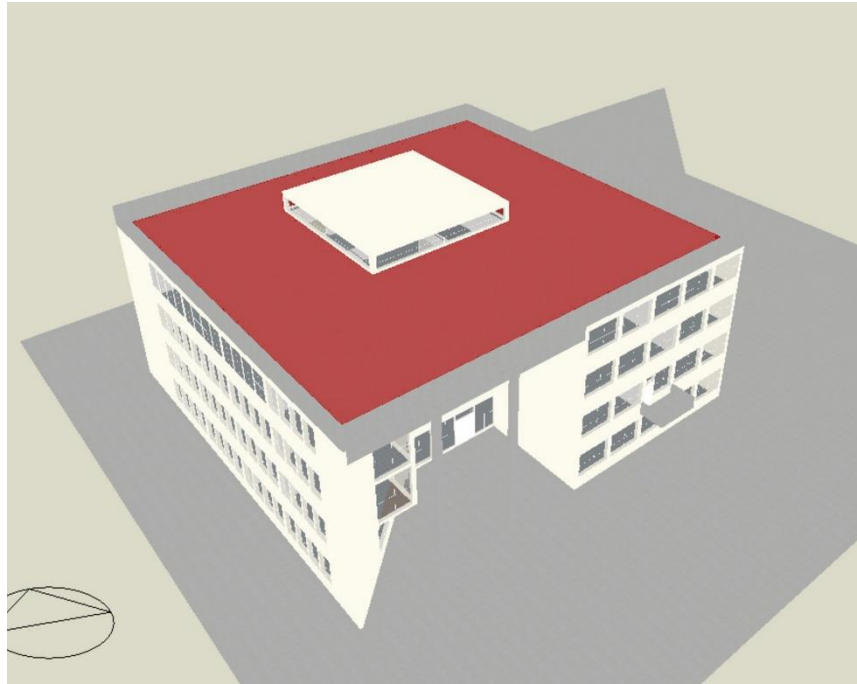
3D view of the new roof drawn in DesignBuilder
